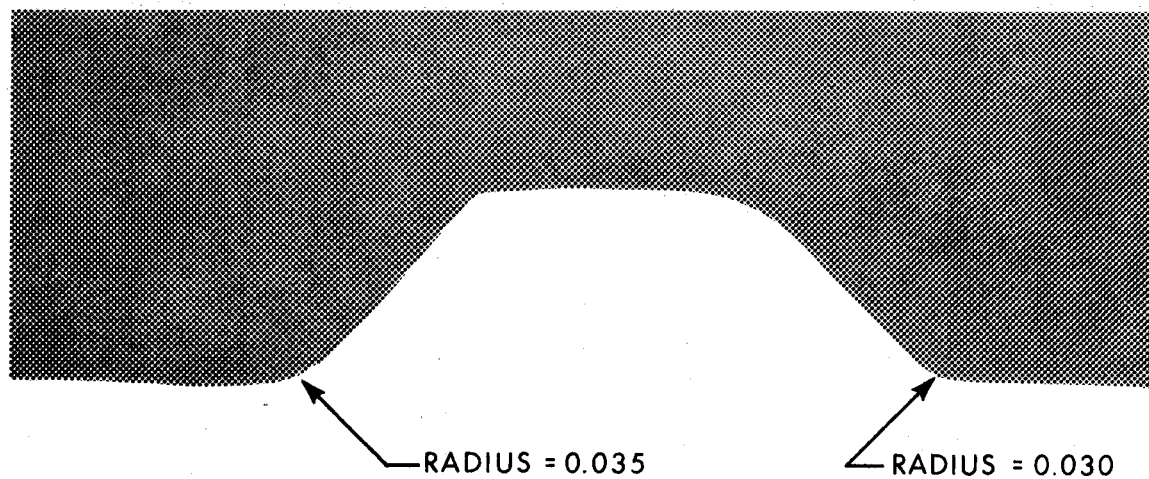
TYPICAL DEFORMED REINFORCING BAR
